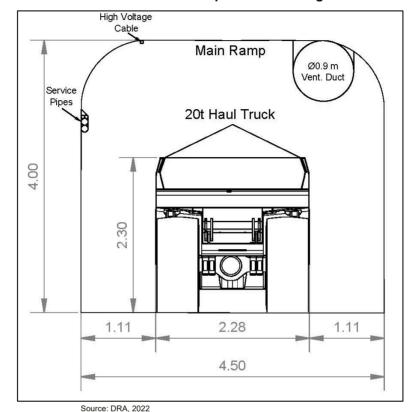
Main Level and Main Ramp General Arrangement with 20-t Truck
